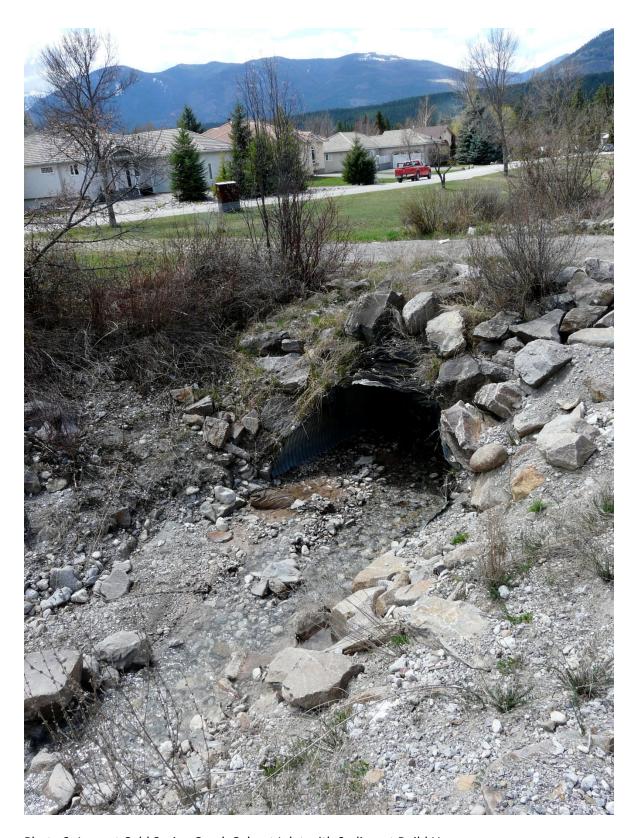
Lowest Cold Spring Creek Culvert Inlet with Sediment Build Up
